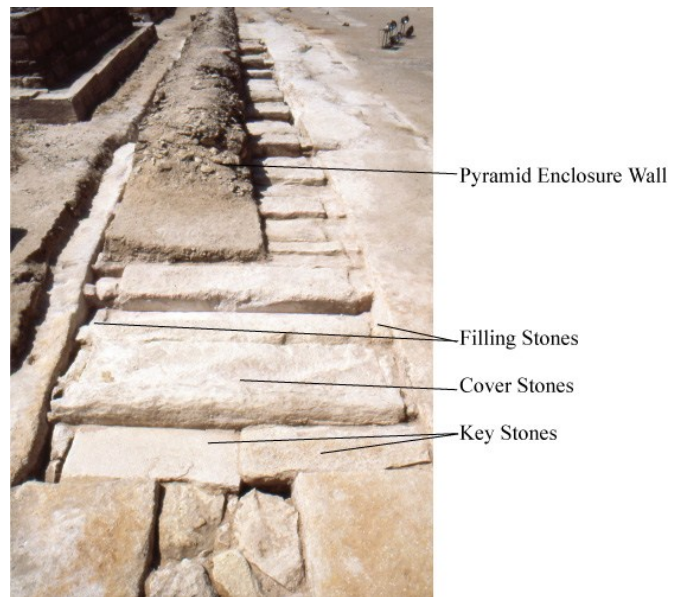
The pit, showing its architectural details and the overlying enclosure wall
